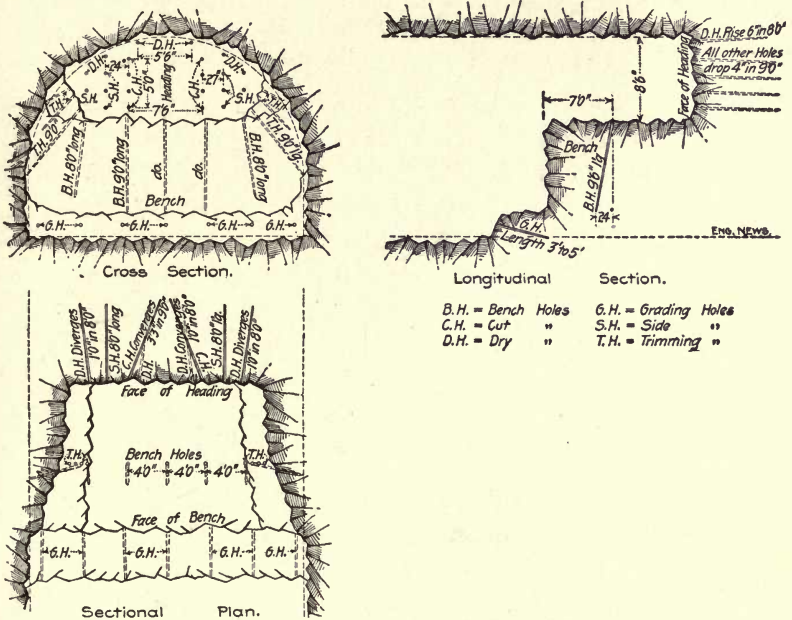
Drilling and Blasting Methods on the New York Rapid Transit Tunnel.
